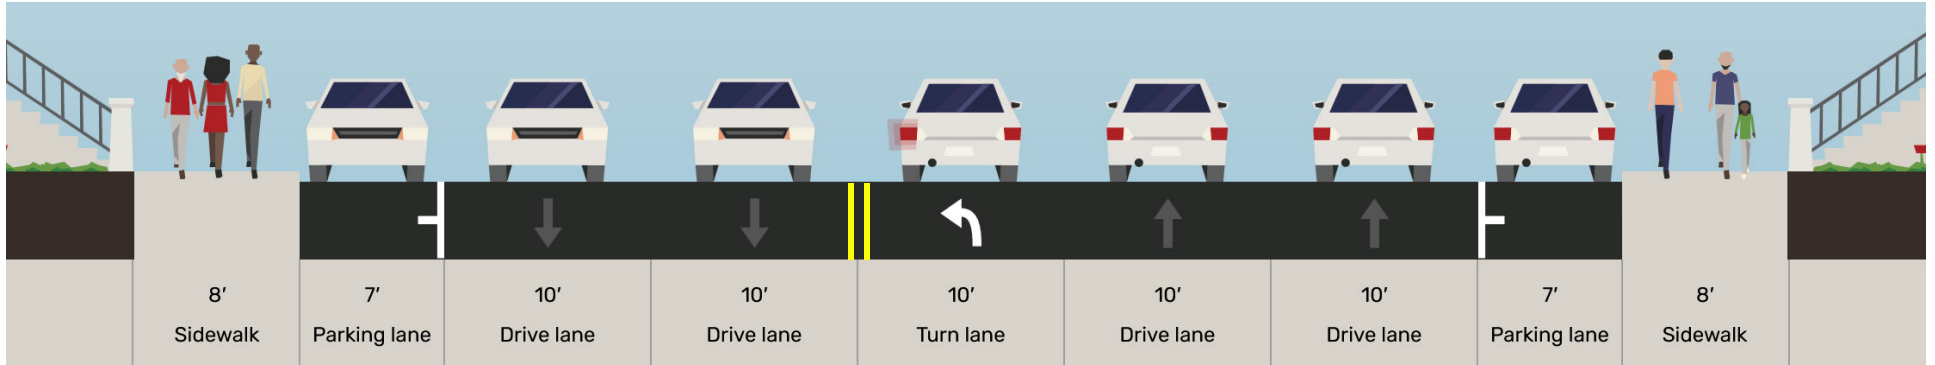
Existing cross-section: W 120th St from Inglewood Ave to Prairie Ave
